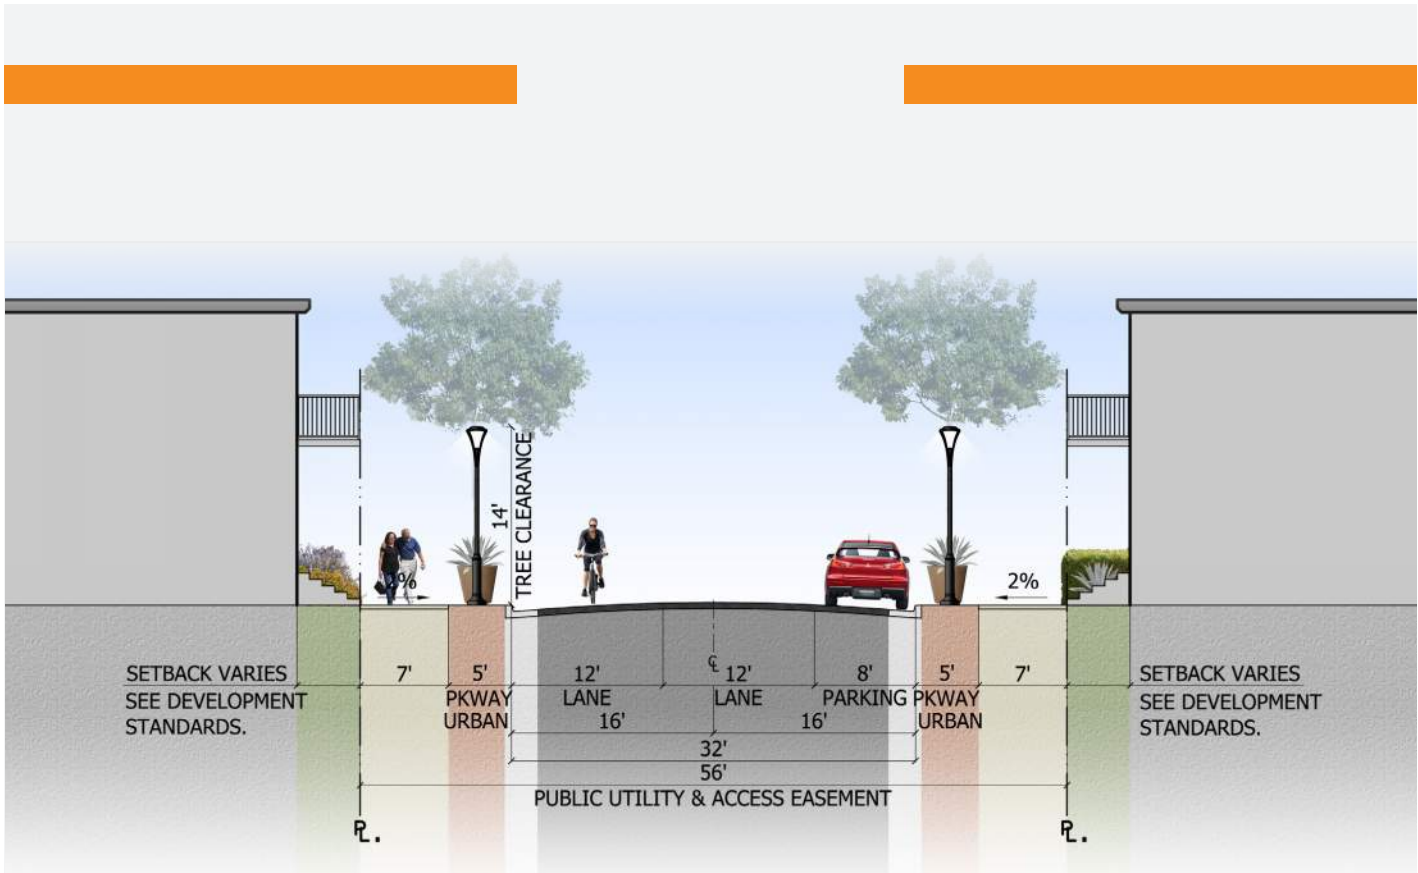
Street Section – Altair Vista (TTM lot F) & A Street (lot I) – Urban Parkways (Private)
